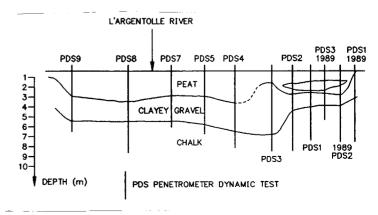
Cross section of the soil foundation along the project axis at the Argentolle site.
